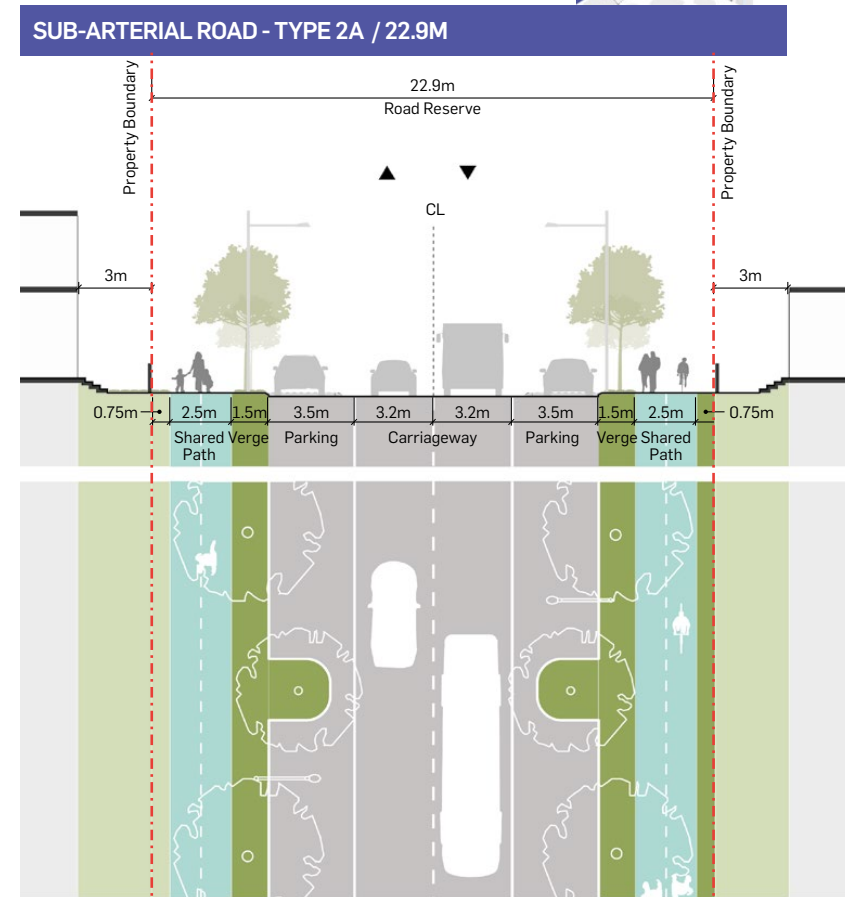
Indicative Street Section B-B' - Sub-Arterial Road - Type 2A
